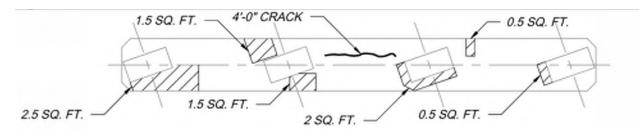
Location of Proposed Concrete Repairs - Pier 2 Plan View MP 182.1
